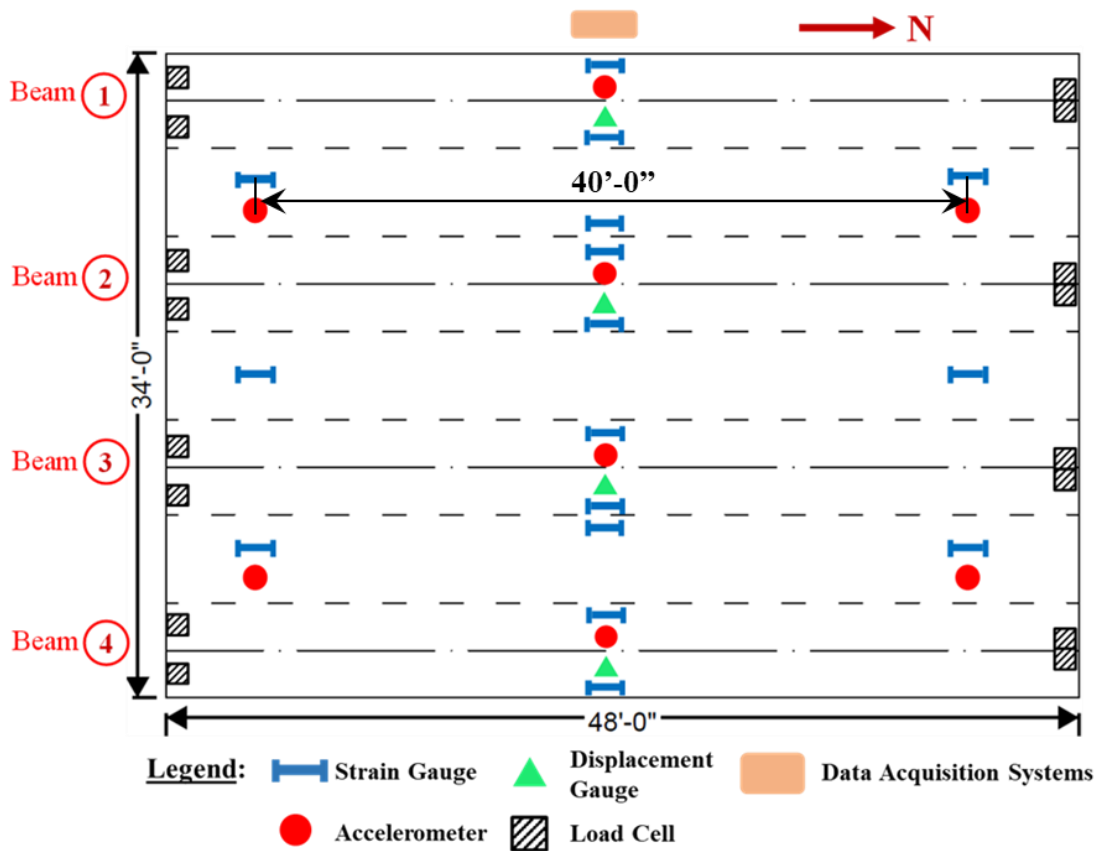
Sensor Layouts and Types for the RELLIS Bridge (Plan View).
